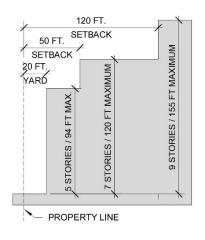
SECTION AT ROCKINGHAM STREET WEST
